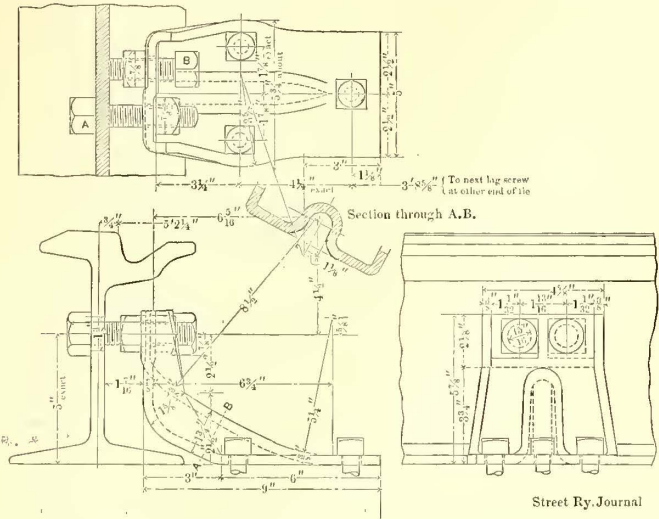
PRESSED STEEL RAIL BRACE FOR HOLDING TRACKS TO GAGE
